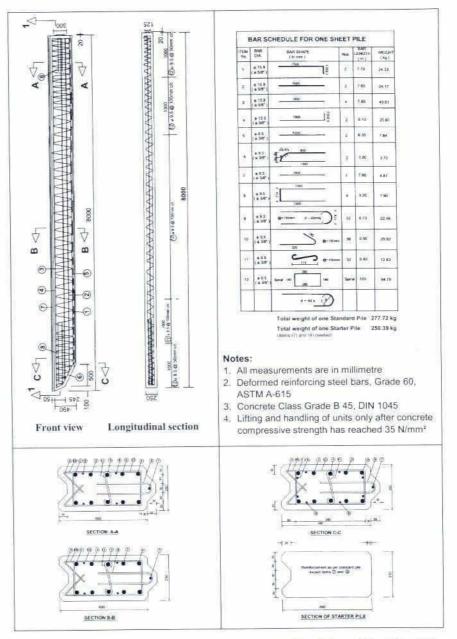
Typical design of reinforced concrete sheet-pile unit (here: 490 x 250 x 8000 mm)
